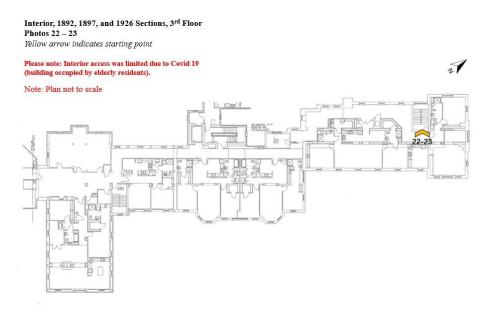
Interior, 1892, 1897, 1926 Sections, 3rd Floor Photo Key (Photos 22–23)
